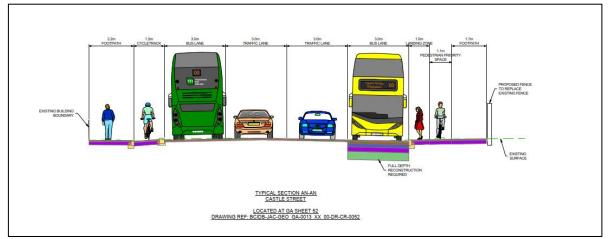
Extract from Typical Cross-section Drawing (Sheet 22)
